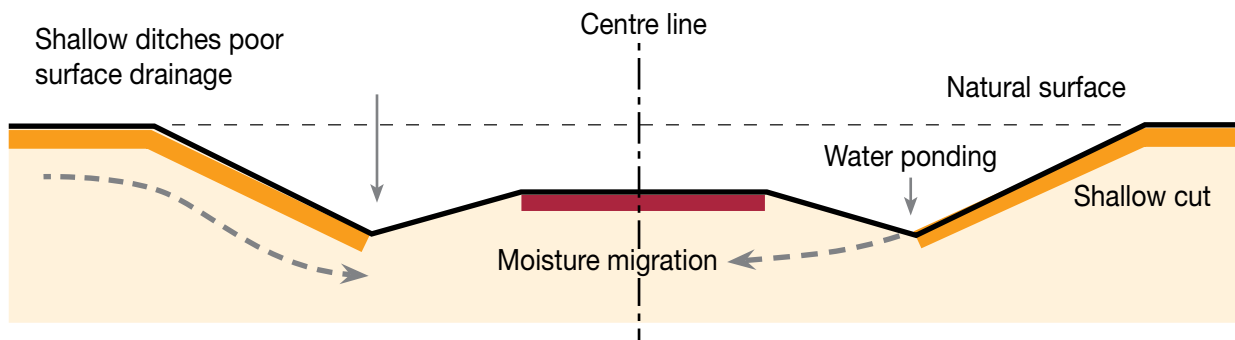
Potential drainage problems associated with depressed pavement construction
